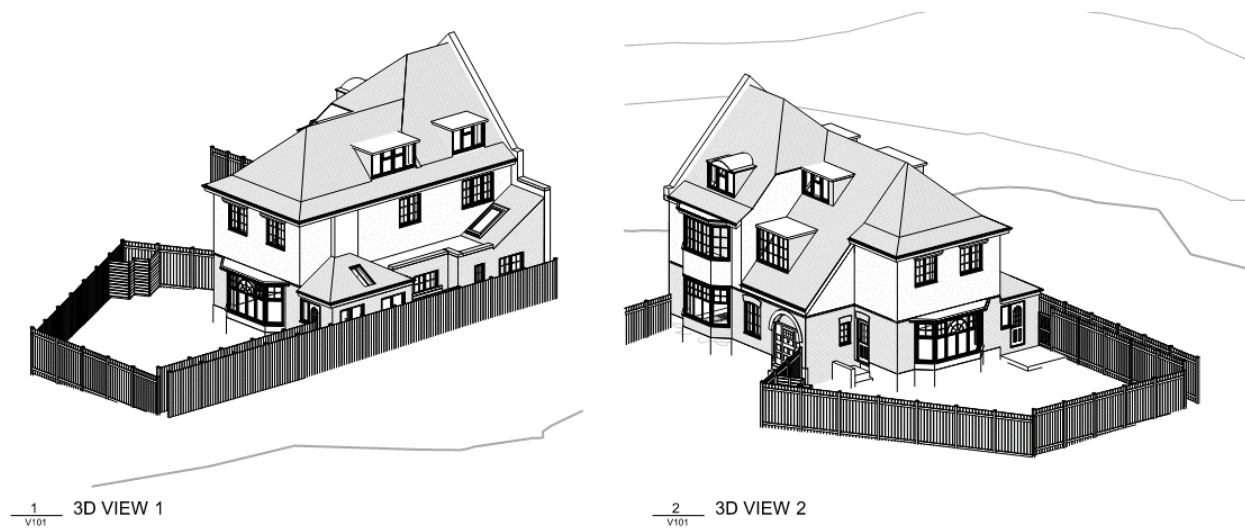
(above): Proposed 3D Views (source: Proposed drawings)
